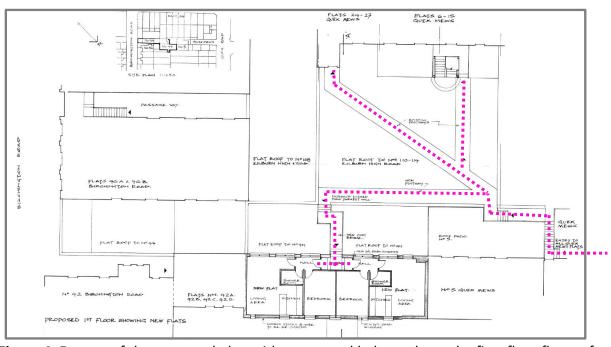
Excerpt of the approved plan with access and balustrade on the first-floor flat roof (Roof-top pedestrian access highlighted for ease of review)
